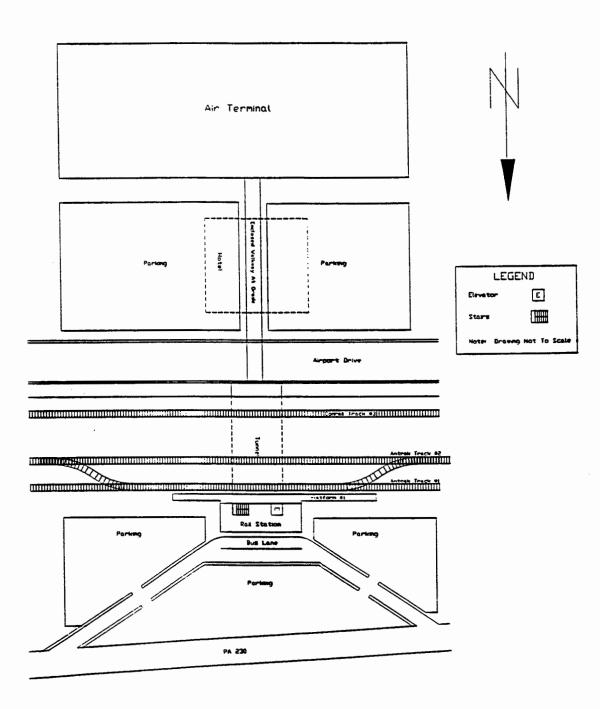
A: Station Side Platform with Tunnel- Plan View
